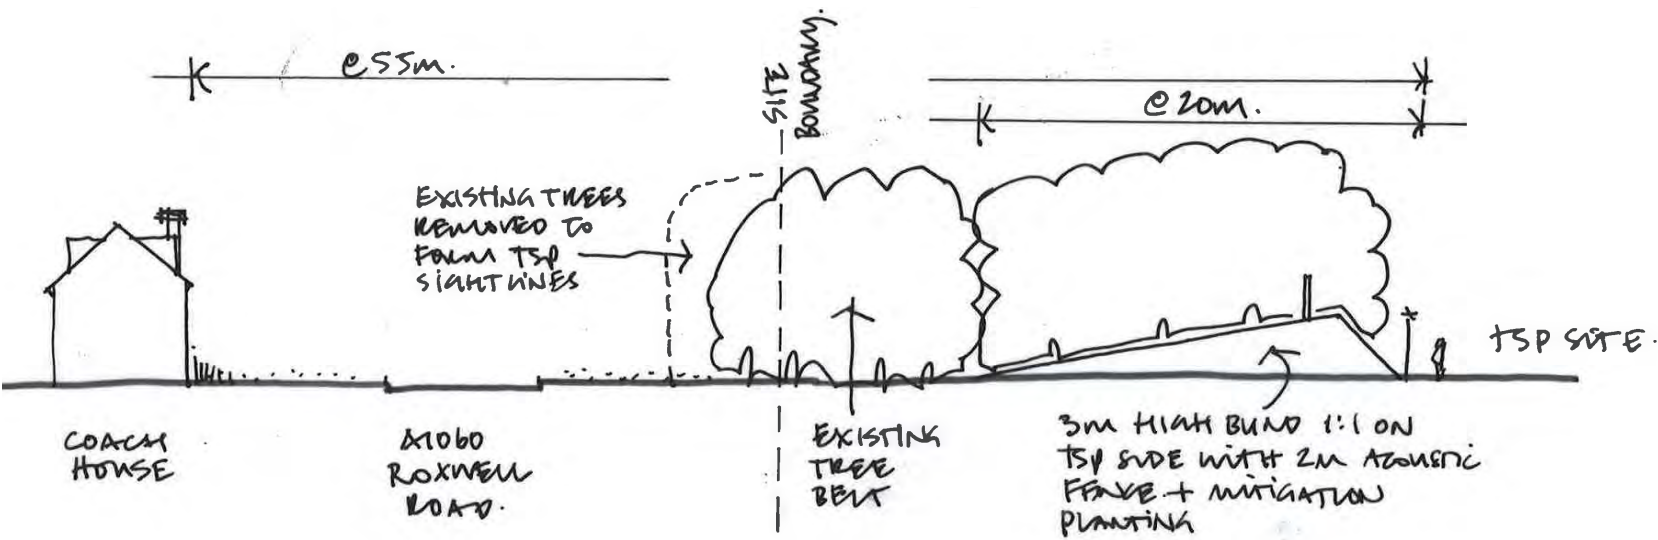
The Travelling Showpeople access (including access to the existing farm) and site section sketch
